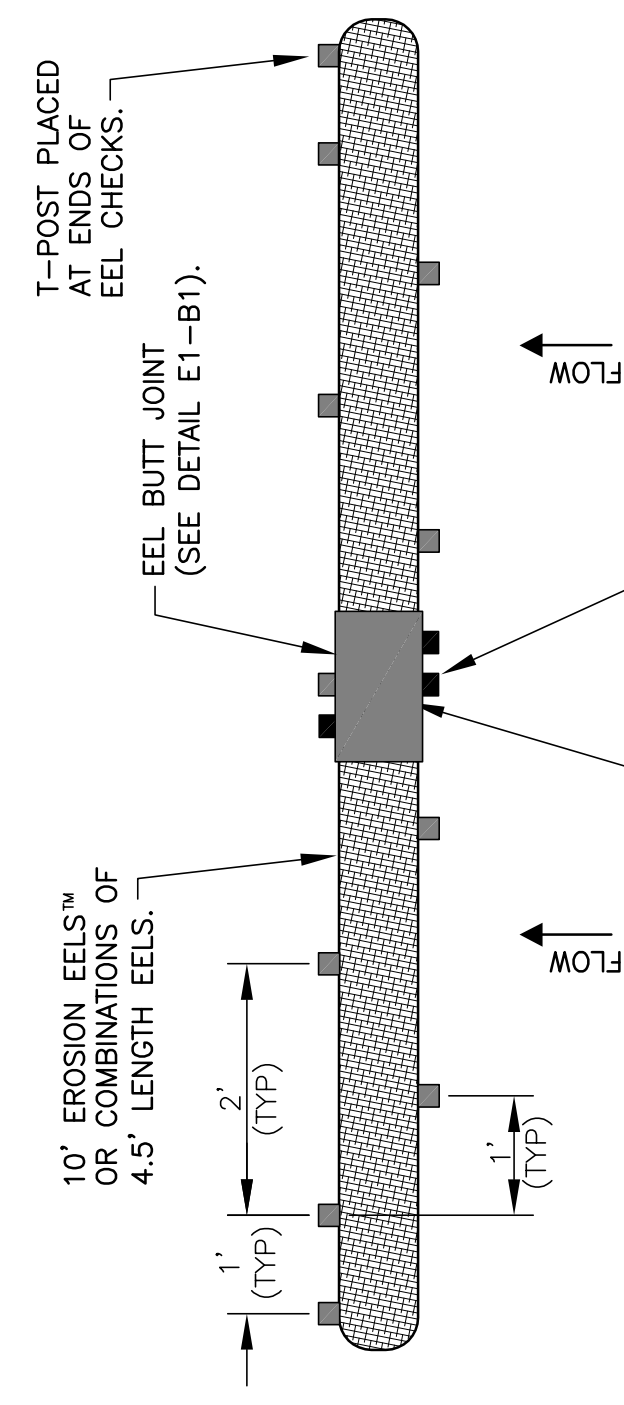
H: CHECK DAMS FOR SHALLOW AND NARROW Y-DITCHES N.T.S.
